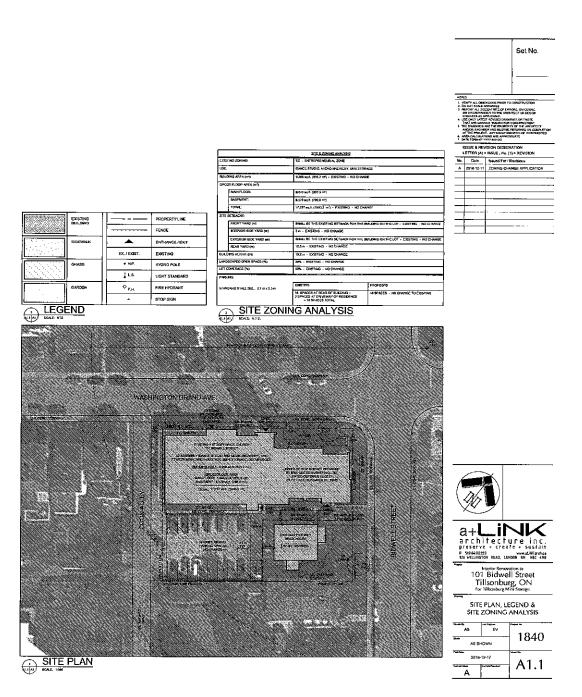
Applicant's Sketch File No: ZN 7-18-12 - 2370392 Ontario Limited (Matheson) Lots 865-866 Plan 500, 101 Bidwell Street, Town of Tillsonburg
